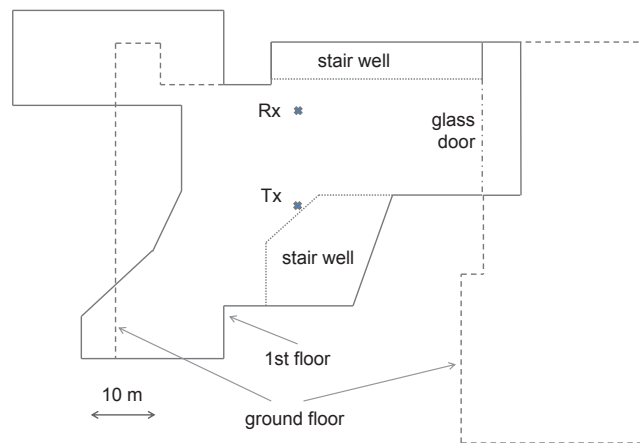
Floor plan (to scale) of “Minneplein” room (first floor). There are two stair wells leading to the “Arteveldeforum” (ground floor), which is separated from the “Pedro de Gante” room by glass doors (dash-dot line). The walls of the first and the ground floor are depicted in solid and dash line, respectively. The Tx and Rx positions of the channel measurement are indicated.
